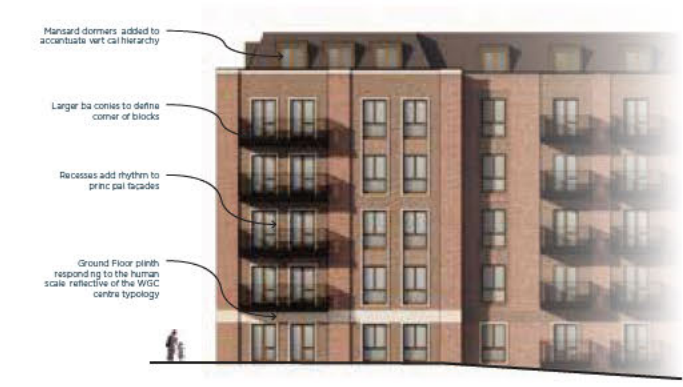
Elevation and feature corner of Block A. Source: Architect's DAS.
